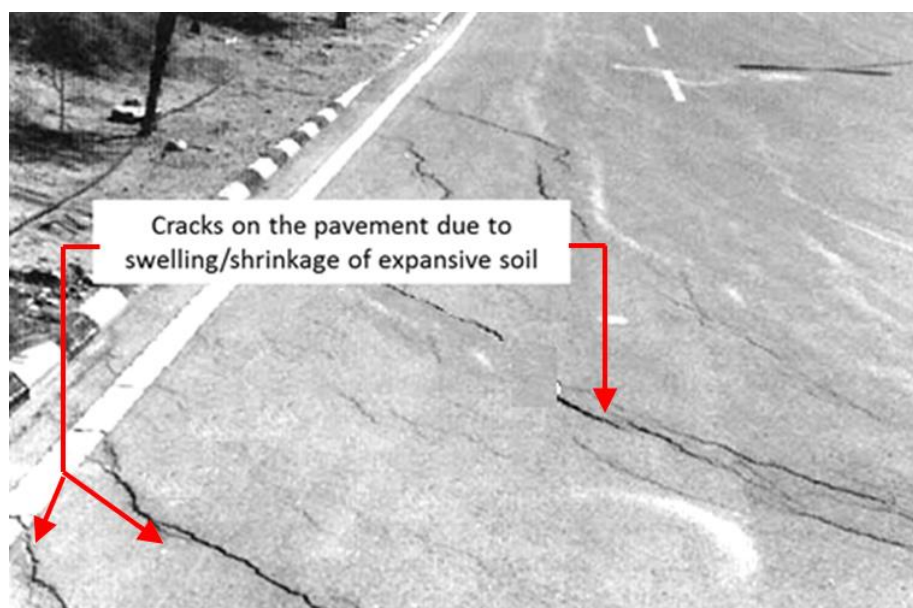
Pavement failure (After Al-Rawas, 2006)
